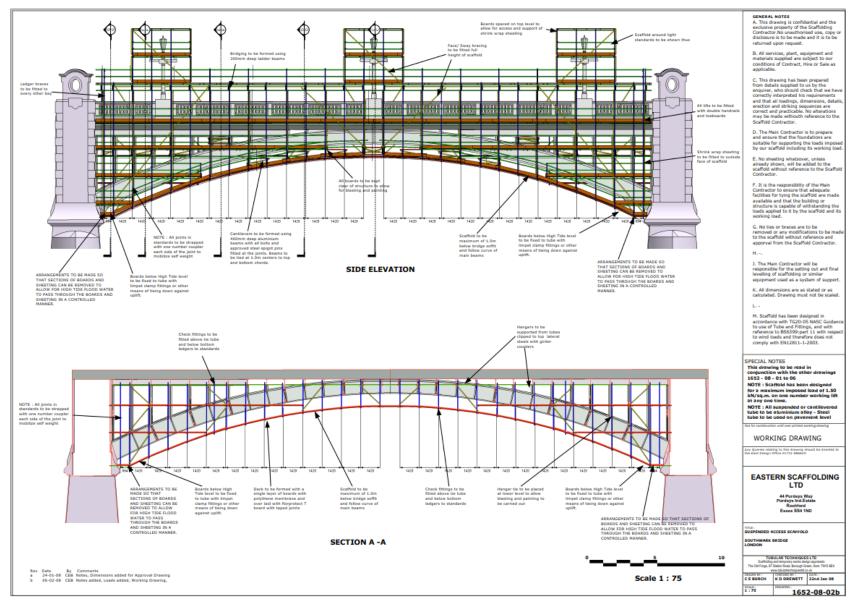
Scaffolding used on Southwark Bridge [2/6]
